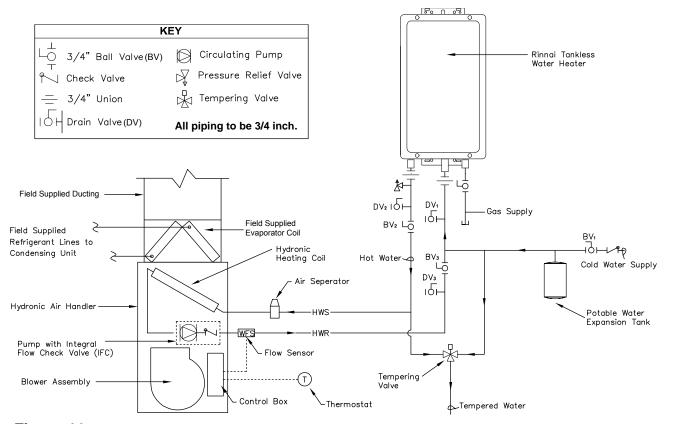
Typical Piping Arrangement For Direct Space Heating and Domestic Water Supply with Tankless Water Heater. Open Loop
